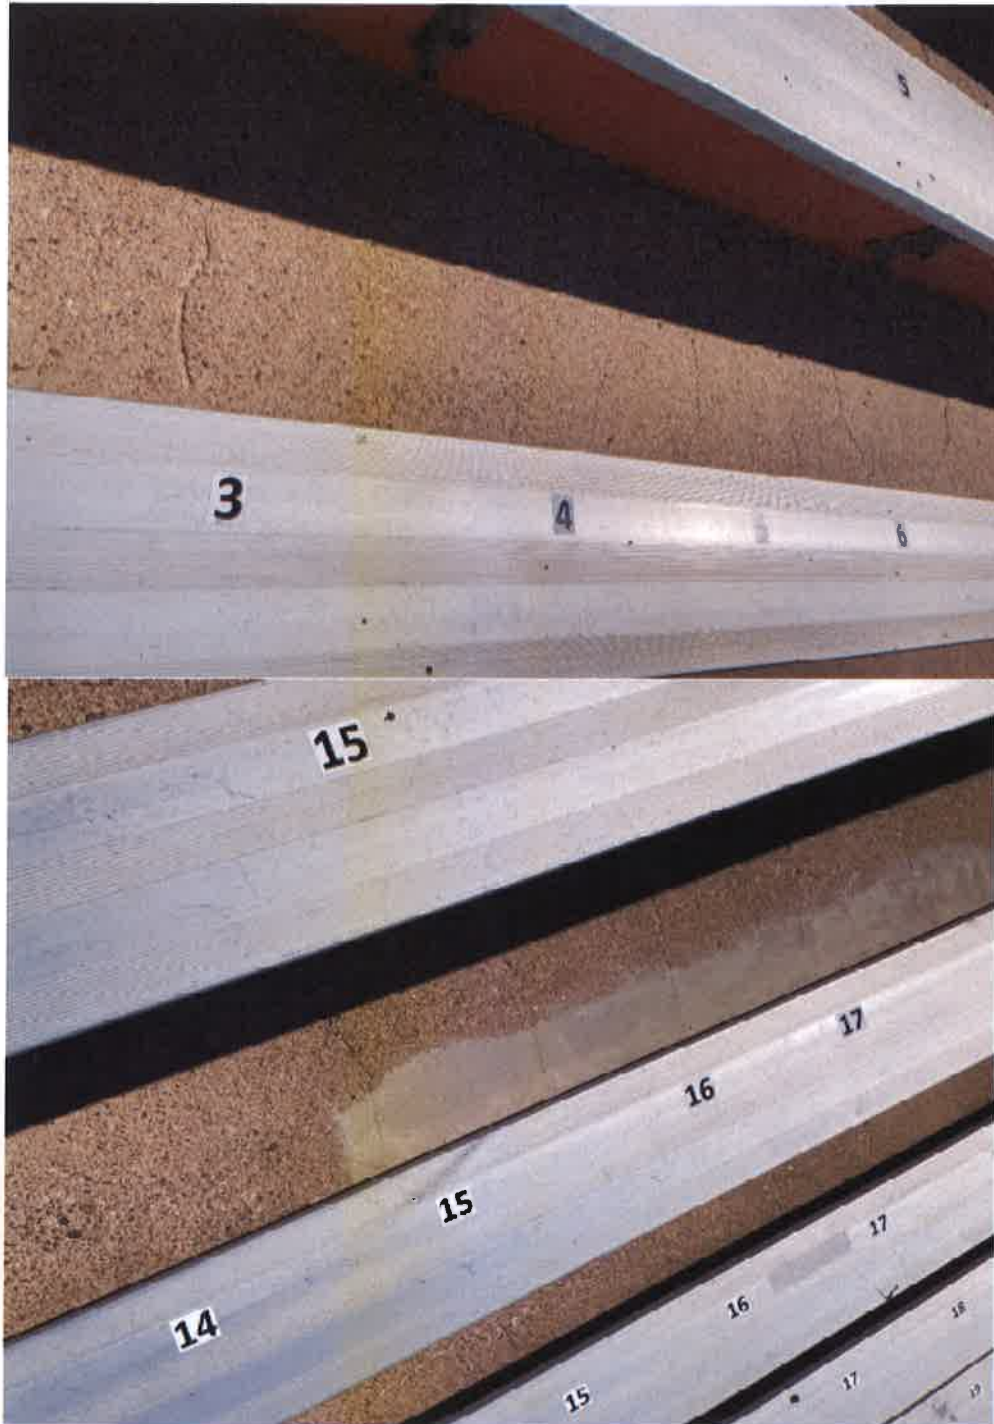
Typical Cracks at Uniformly Distributed For Entire Span on Each Beam
